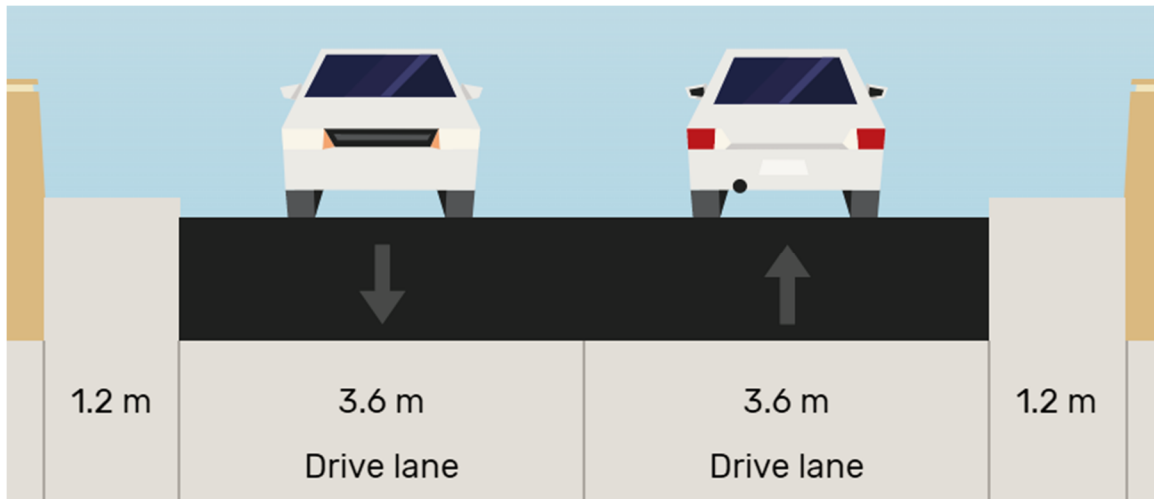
Bridge Cross Section – Existing (for illustration purposes only)
